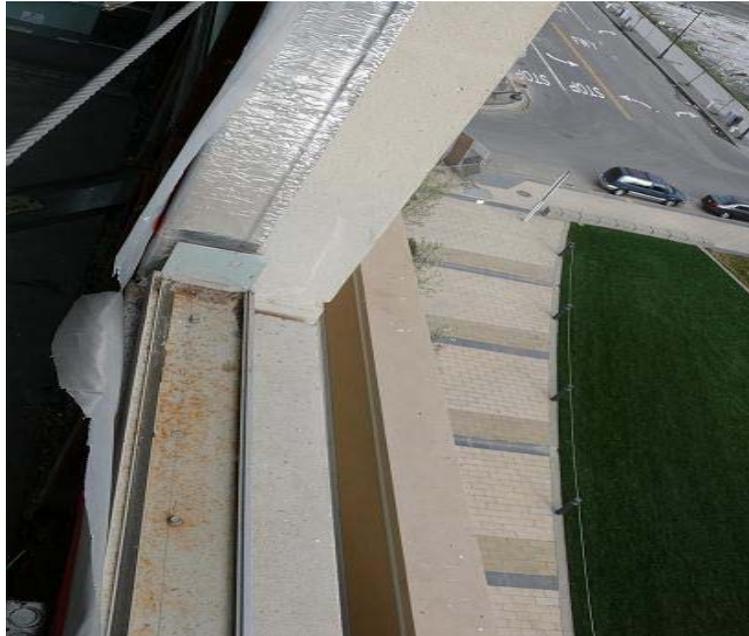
Bottom sill installed on the Glass Fiber Reinforced Concrete (GFRC)
